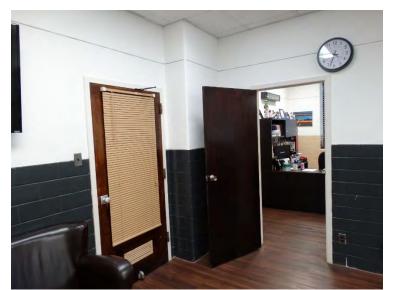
Typical office on first floor, with applied vinyl flooring and painted wall tiles
